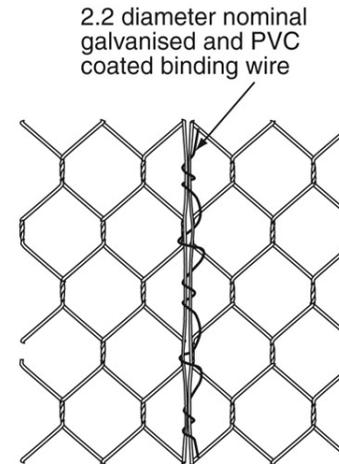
Typical Scheme for Arrangement of Steel Double Wire Mesh against Rockfall.
